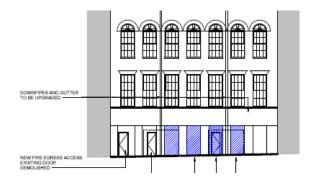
Beneficial House—Wynyard Lane elevation—showing approved changes to the rear lane façade of the building. (Source: Make + Architectus, A2301 set, 14 February 2017)
